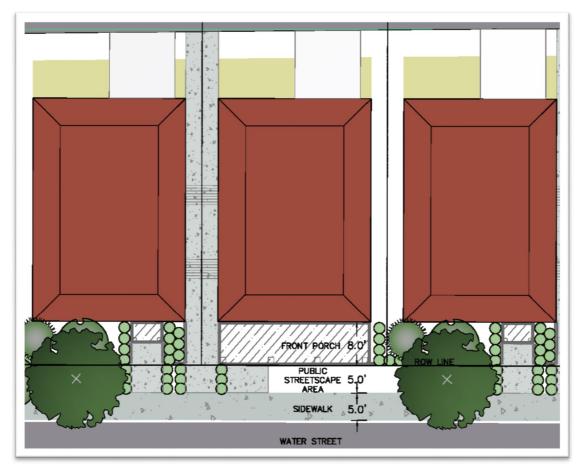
Public Streetscape Dimension Exhibit (Not to Scale)
